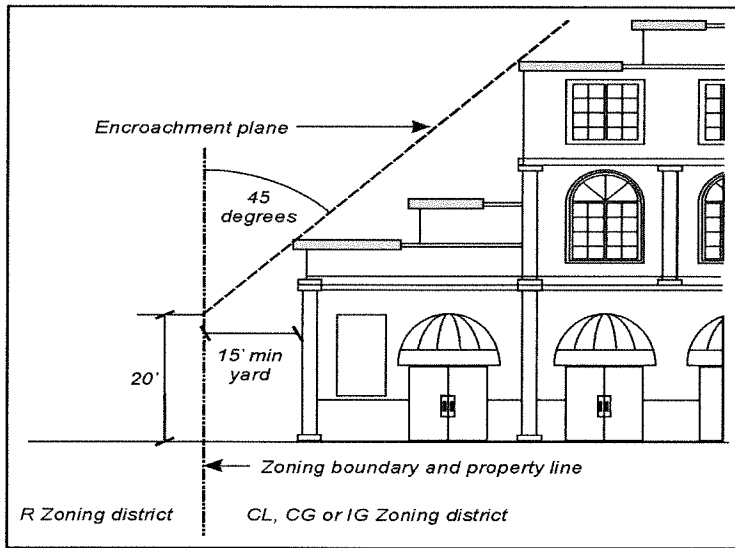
Encroachment Plane Requirements for Projects Abutting RS and RM-12 Zoning Districts
